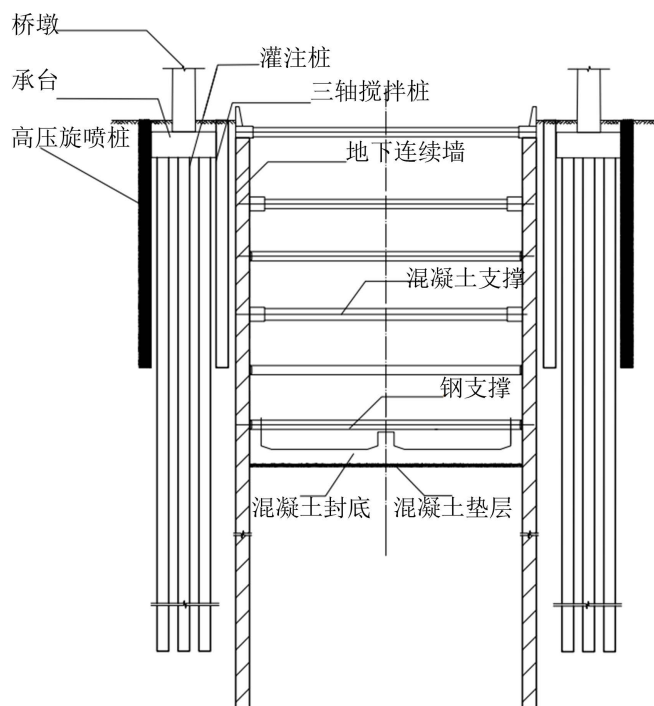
Station deep foundation pit and viaduct bridge foundation arrangement section
